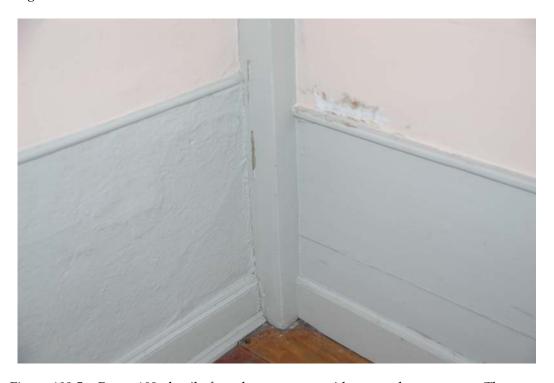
Room 108, detail of northwest corner with exposed corner post. The west wall (on the left) is plaster below the chair rail while the north wall (on the right) is horizontal board wainscot. The chair rails do not align and the west wall has a different baseboard and an added shoe molding.
